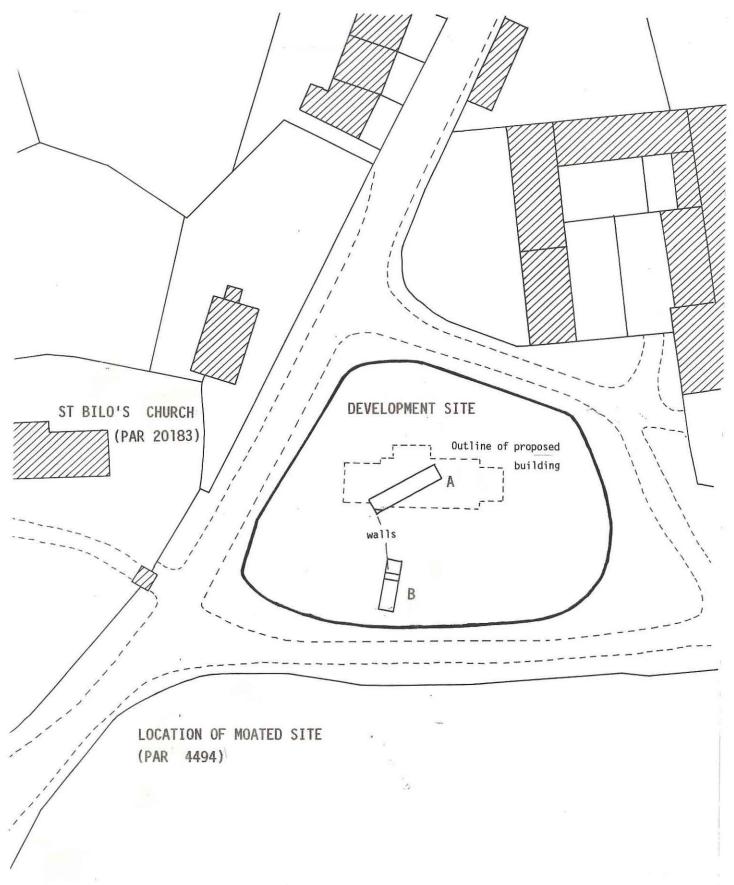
Location Plan of Evaluation Site Trenches (1:500).
